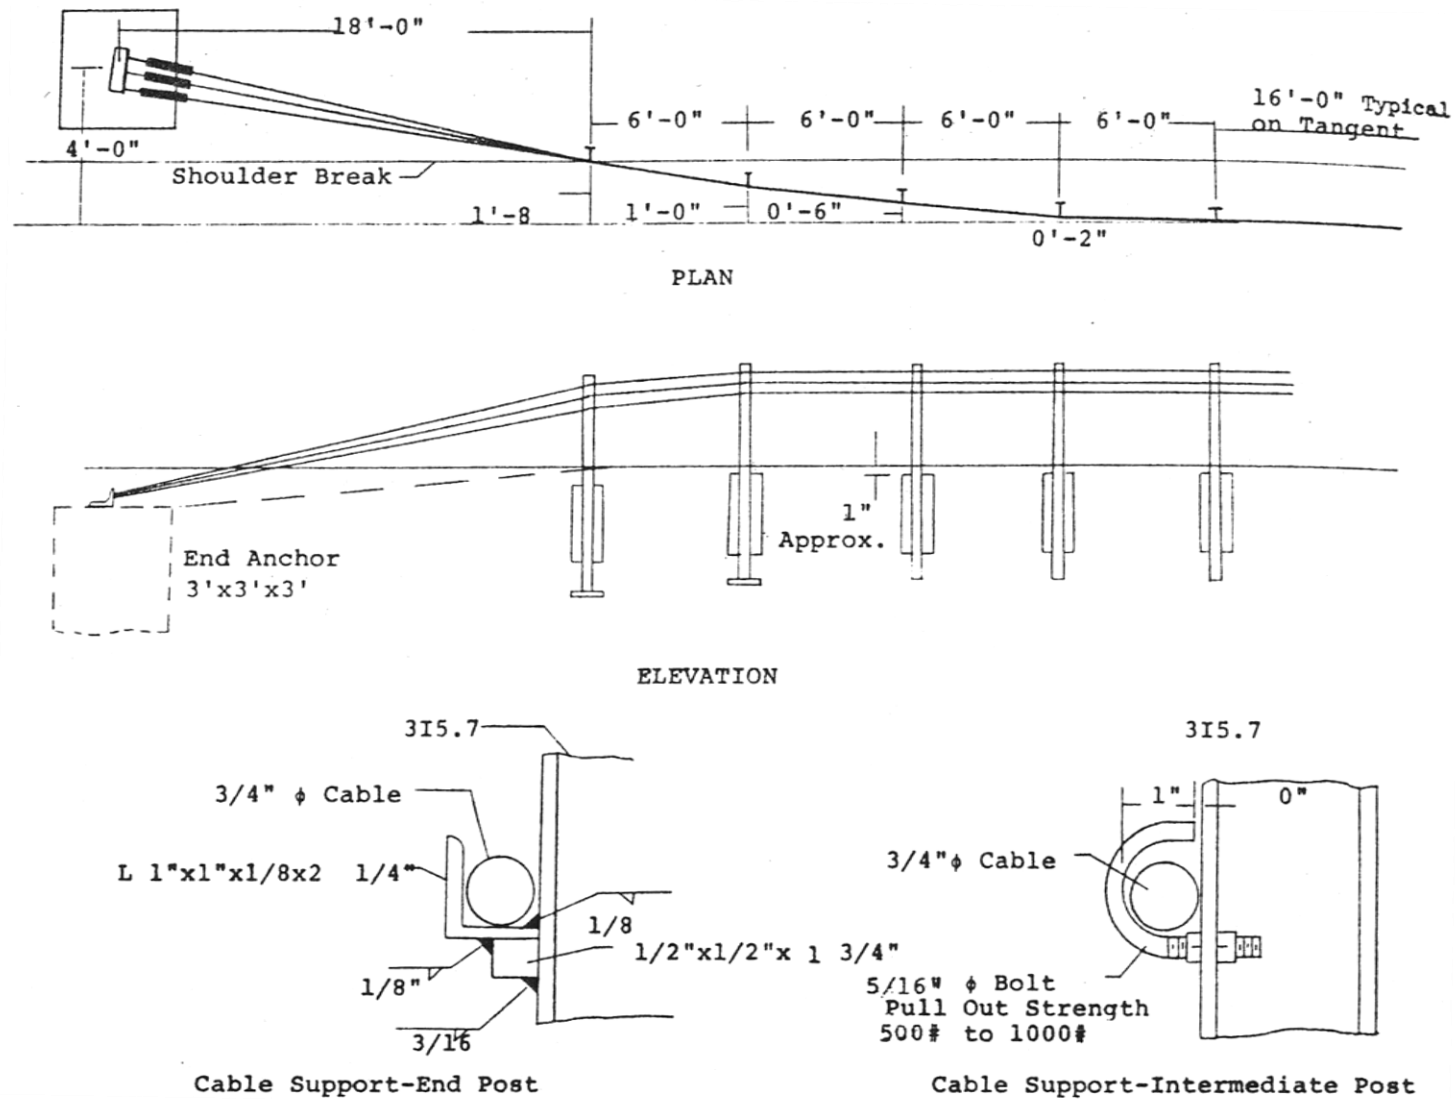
Final Tested Barrier Design, New York, 1967 [13]
